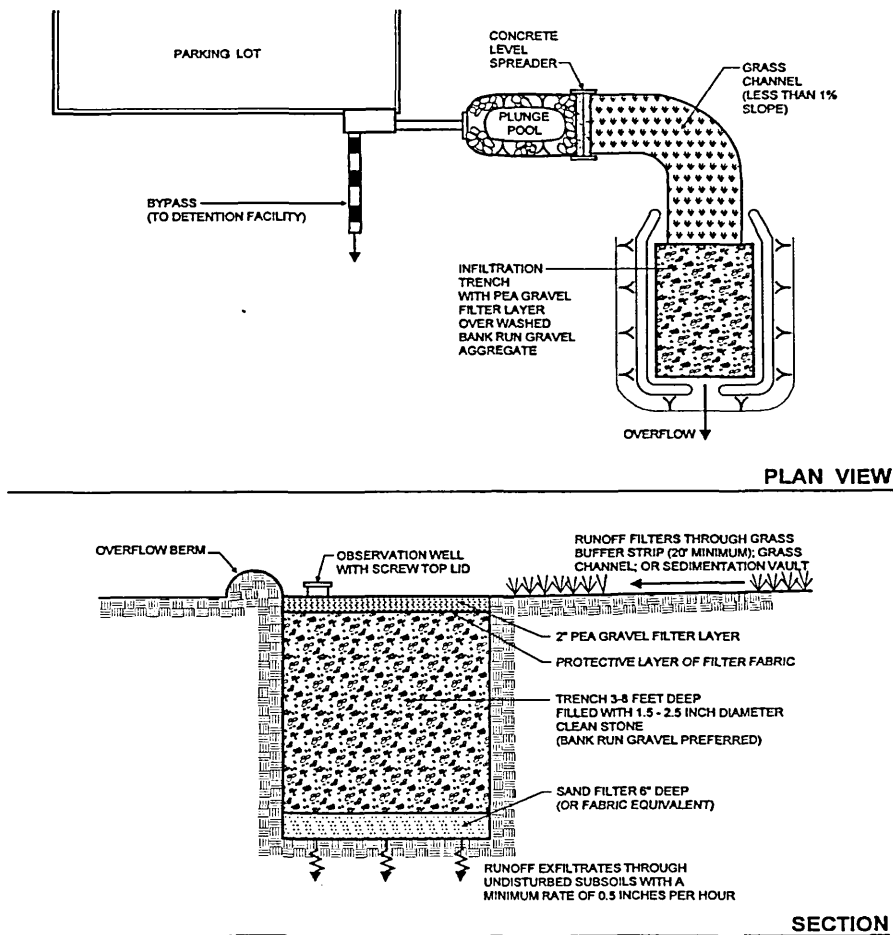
Schematic of an infiltration trench system – US example (MDE, 2000)
